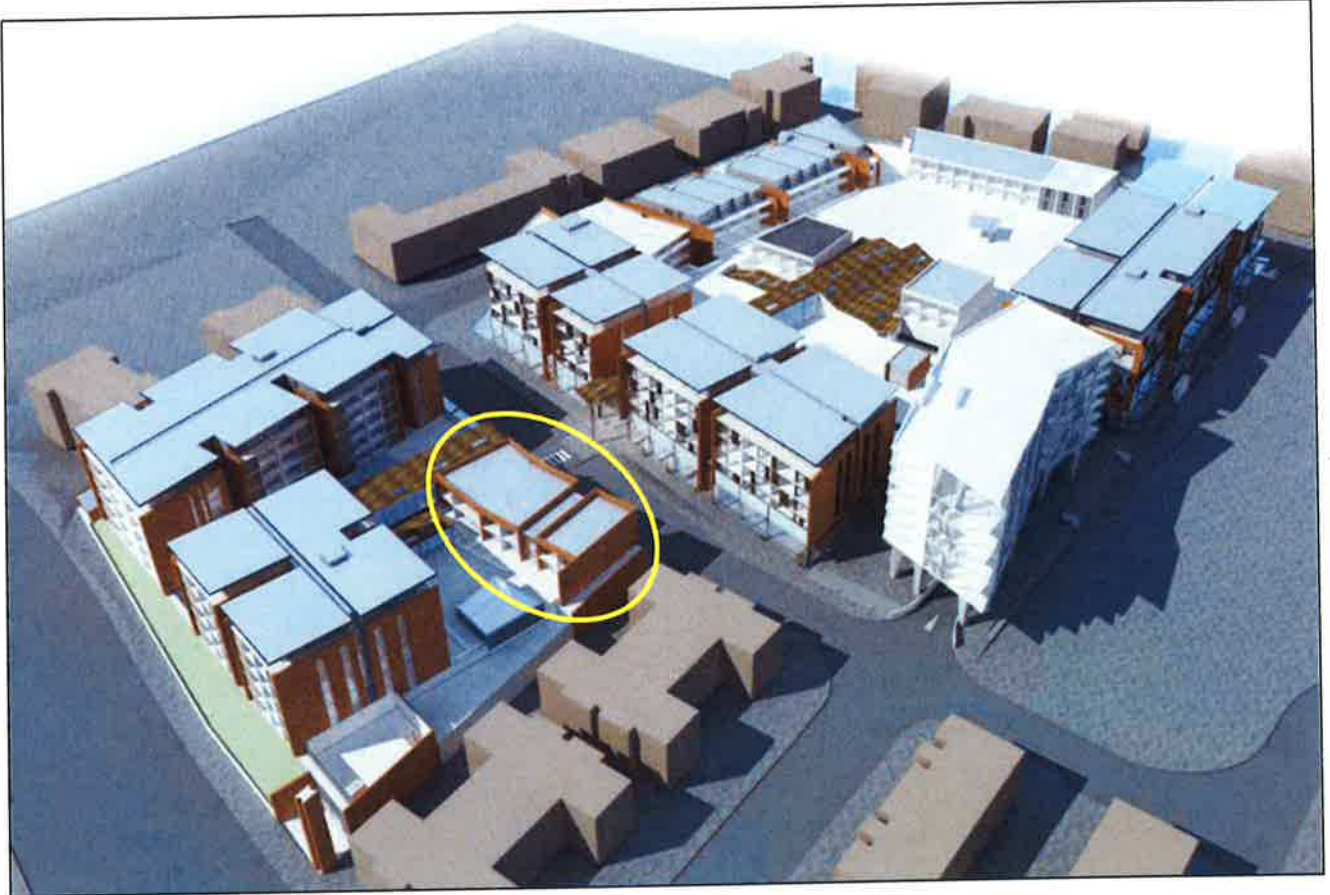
Indicative approved site layout with Building 1B highlighted (note: minor changes to built form were made after this image was prepared). (source: Proponents PPR for original application)
